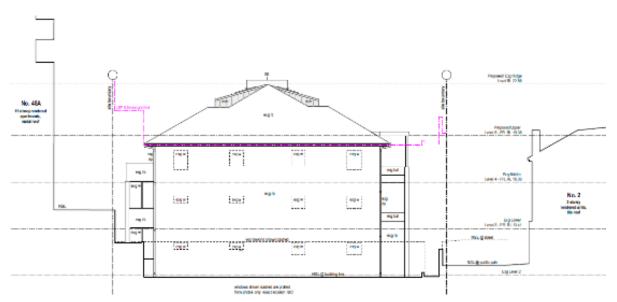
Plan extract northern elevation showing minor intrusion into view plane.
